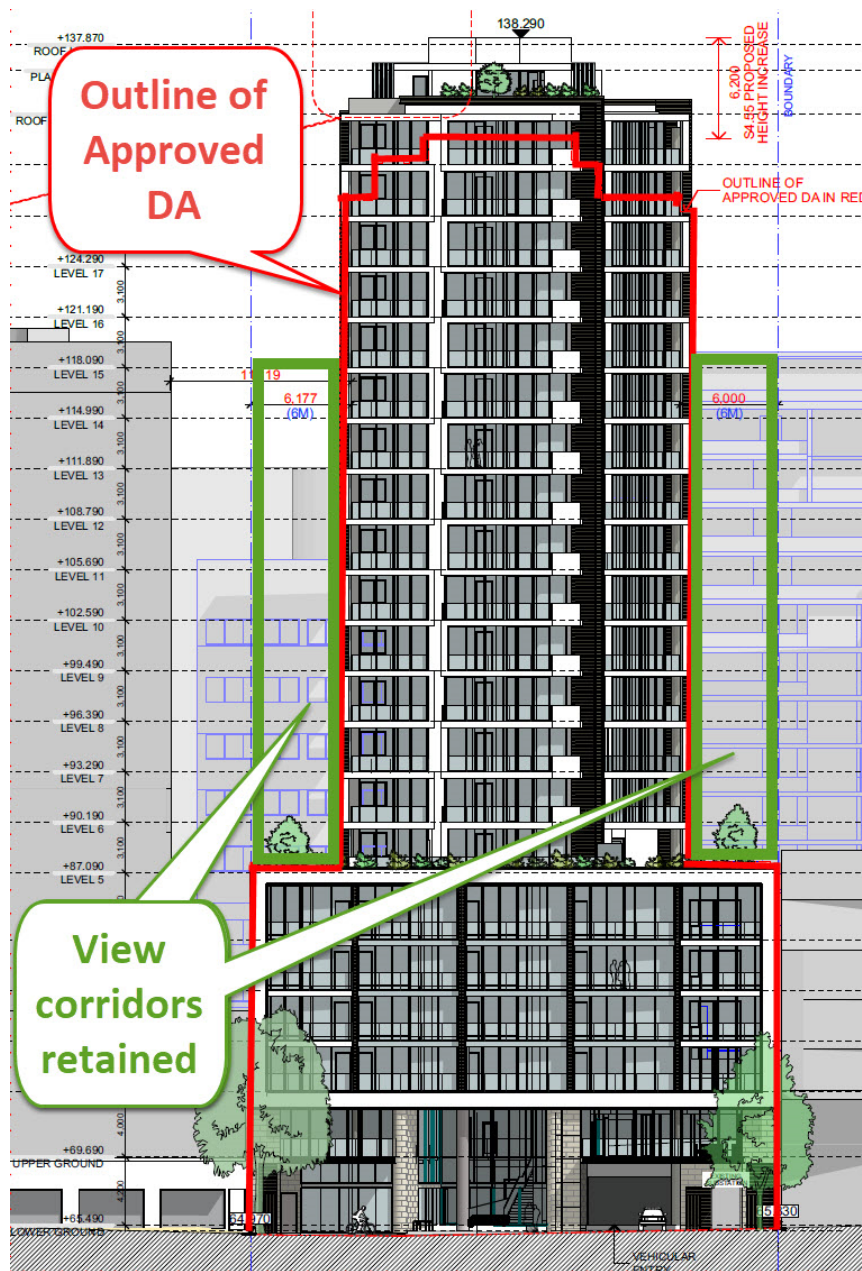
Proposed North Elevation (Grafton Street) showing overlay of approved DA and retained view corridors (Source: Cottee Parker, DA2300)
